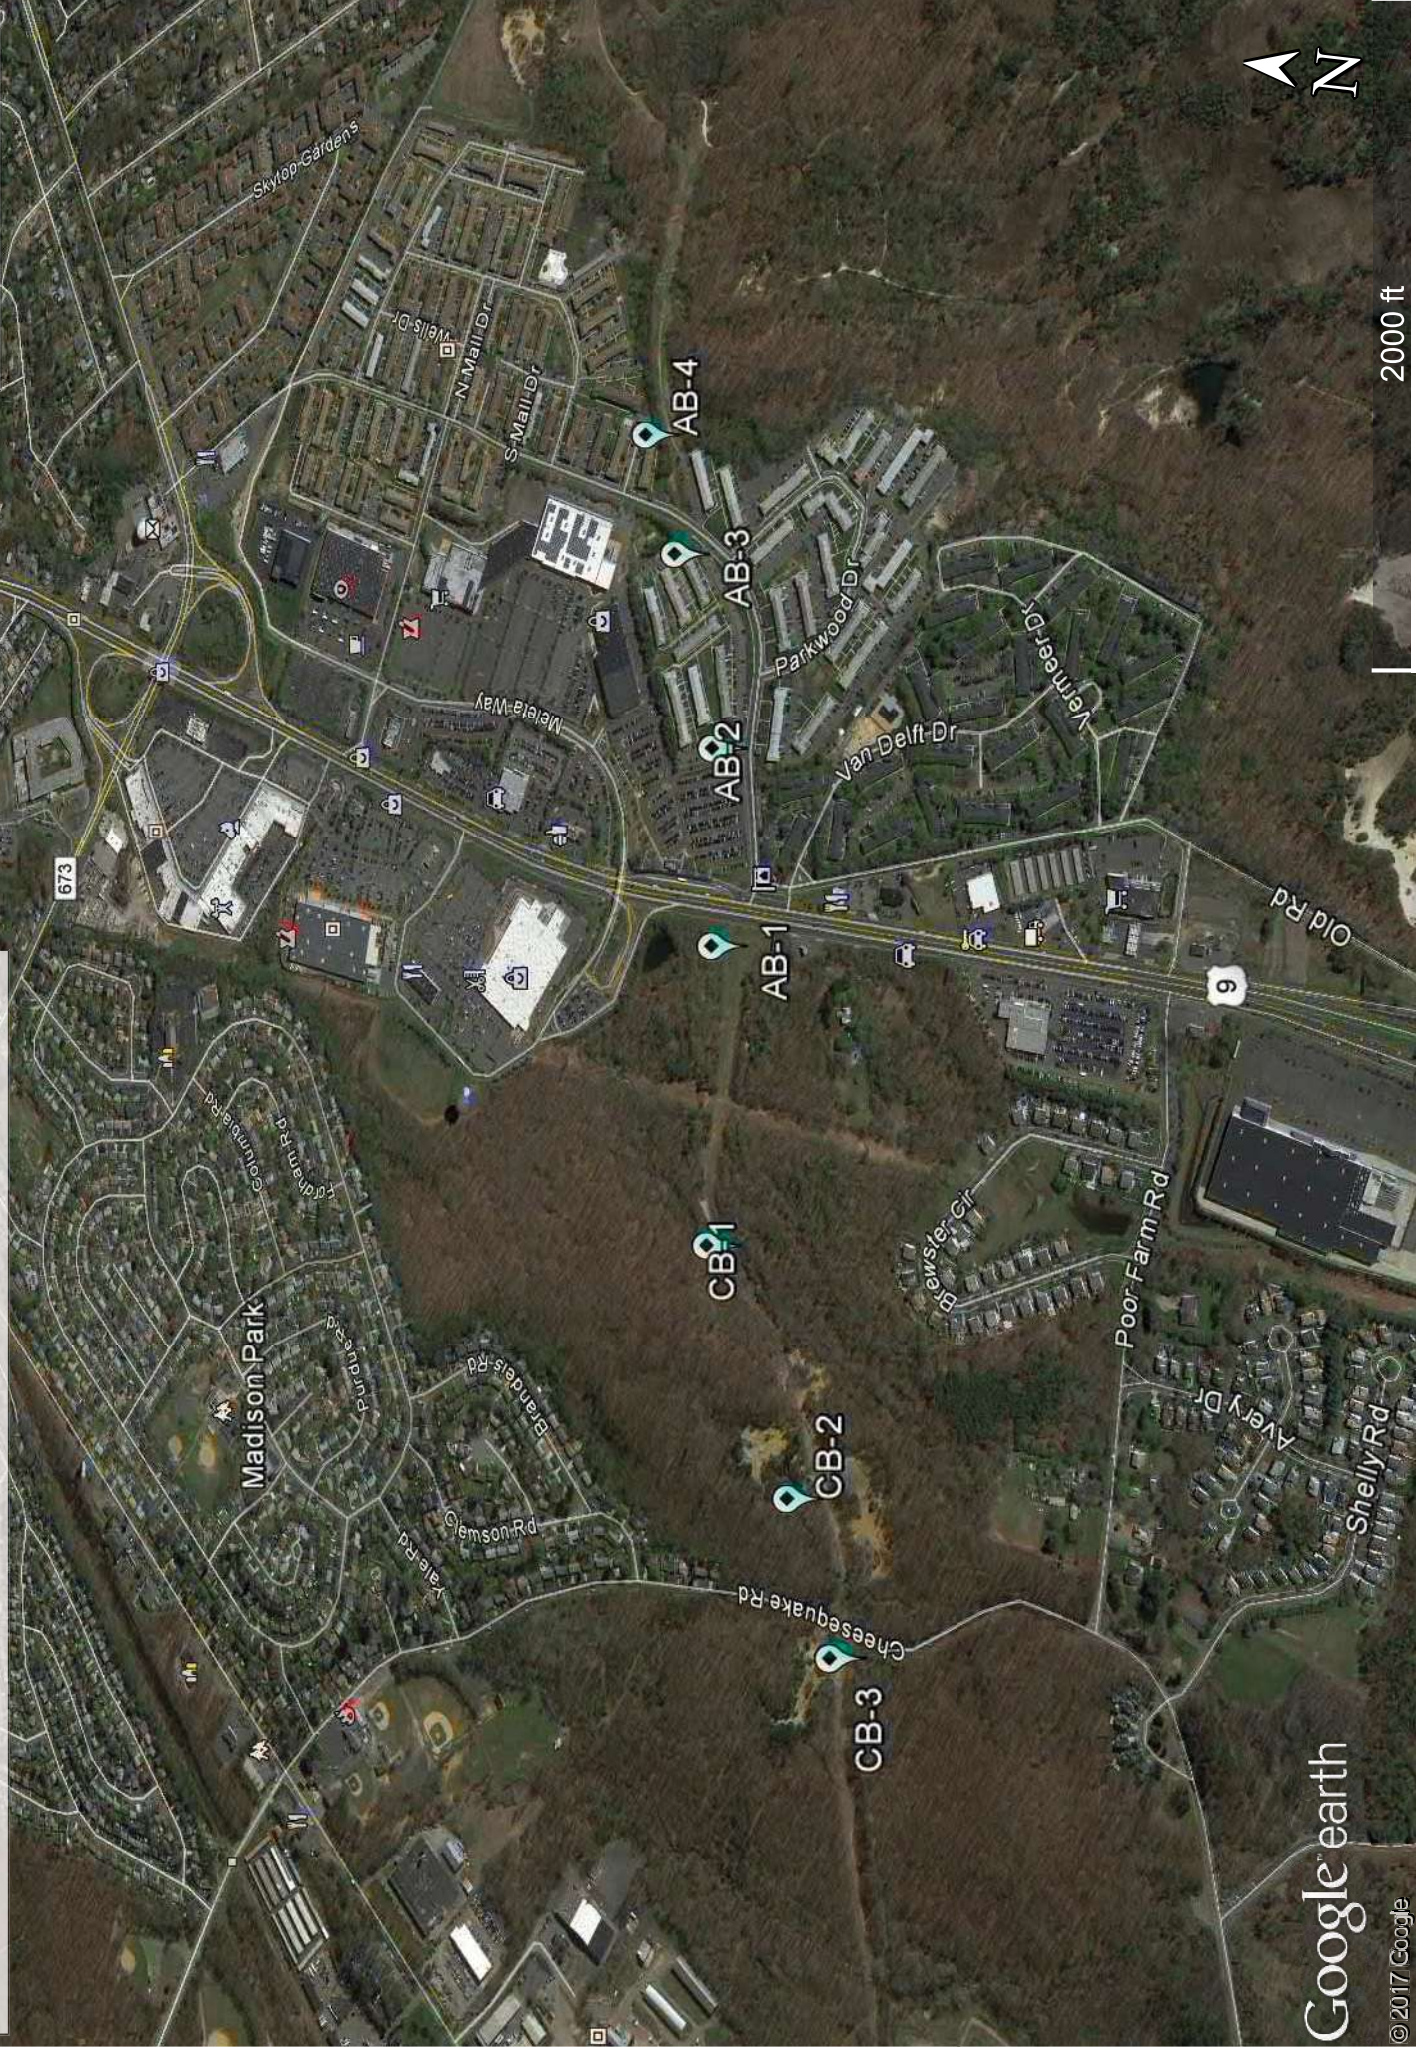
BORING LOCATION PLAN (2 of 2)
